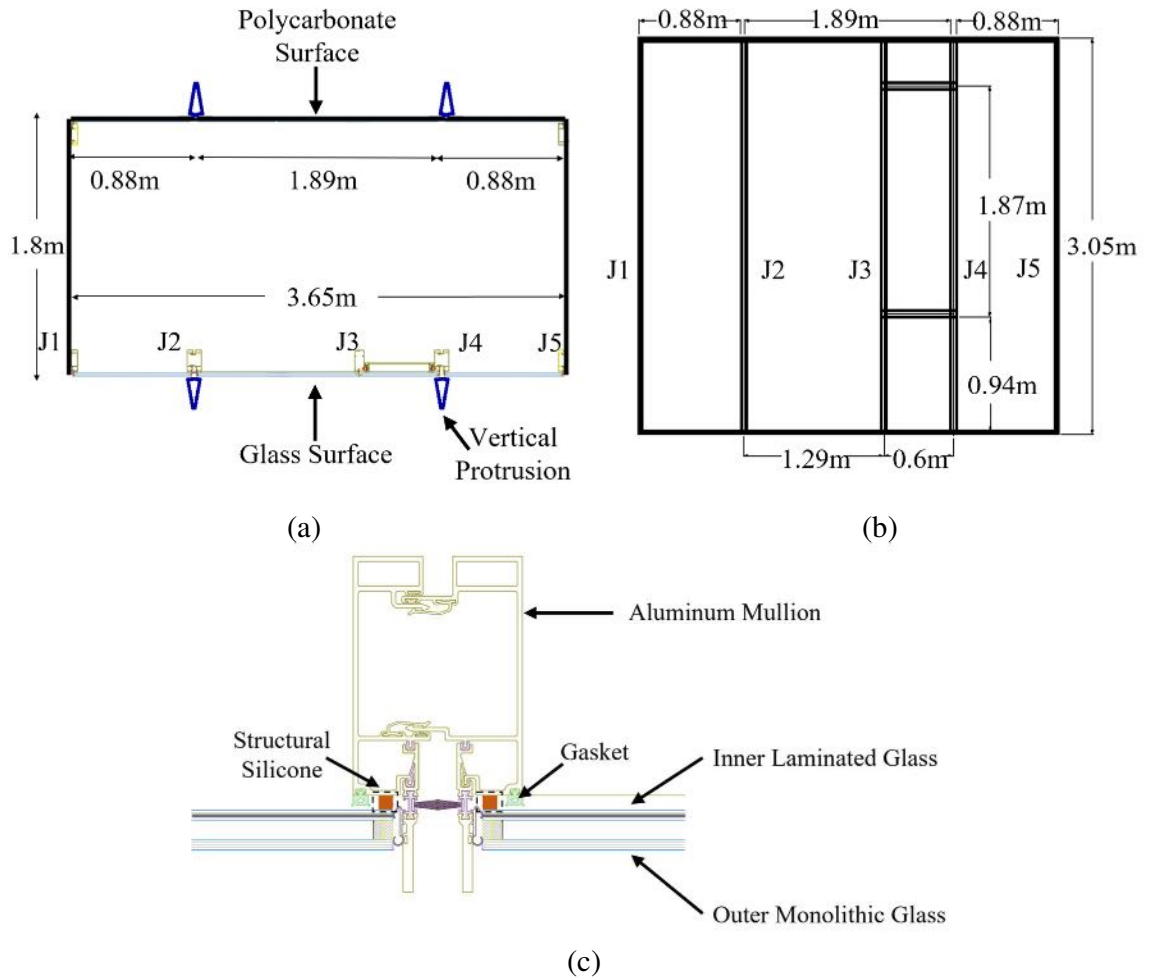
The overall dimension of the tested single skin curtainwall, where J# refers to a vertical joint number: (a) Plan view (shown with vertical protrusions); (b) Elevation view; (c) Cross-section of Joint
